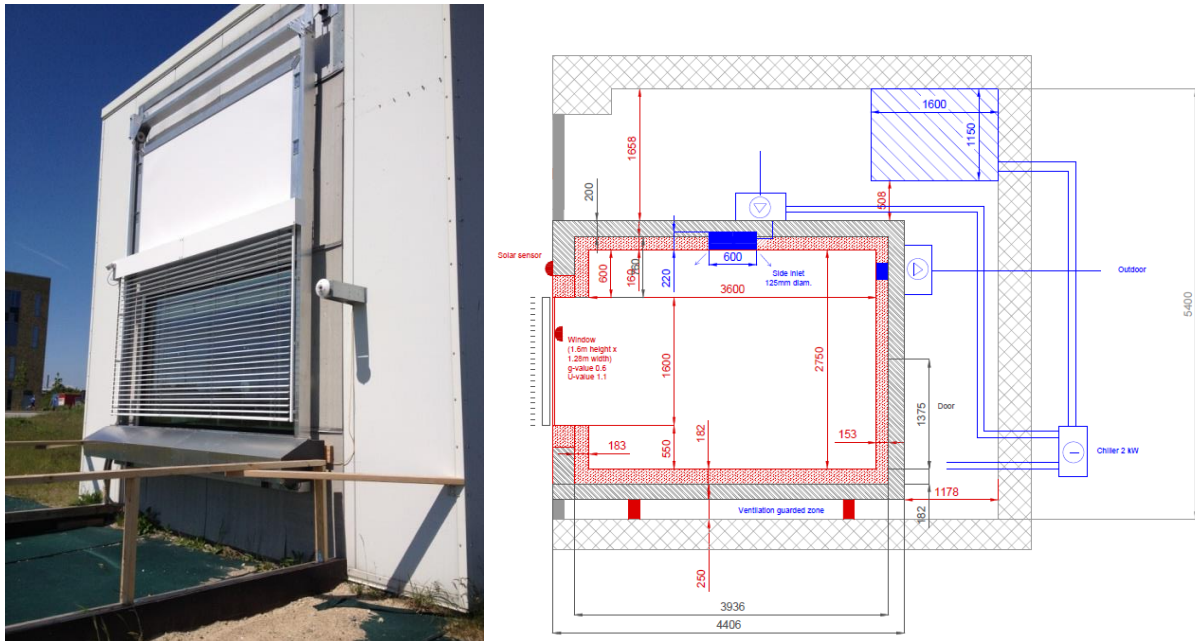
Full-scale test facility in Aalborg University-Cube. (Left: test facility, Right: section).
